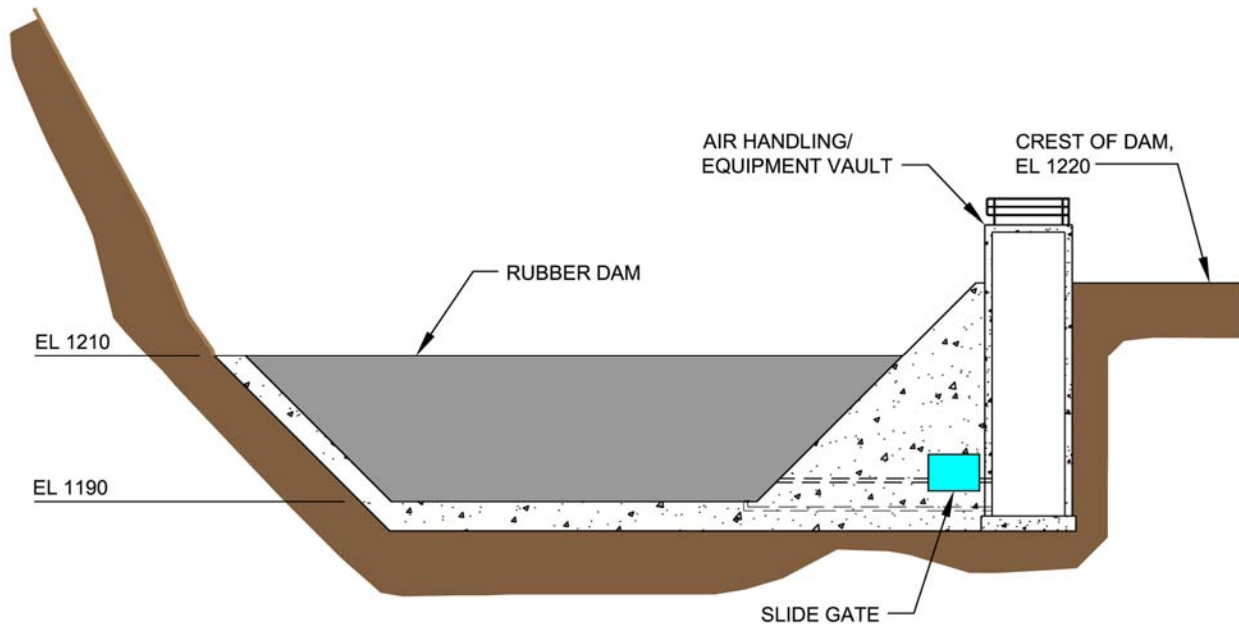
Rubber Dam Upstream Elevation in Existing Spillway
